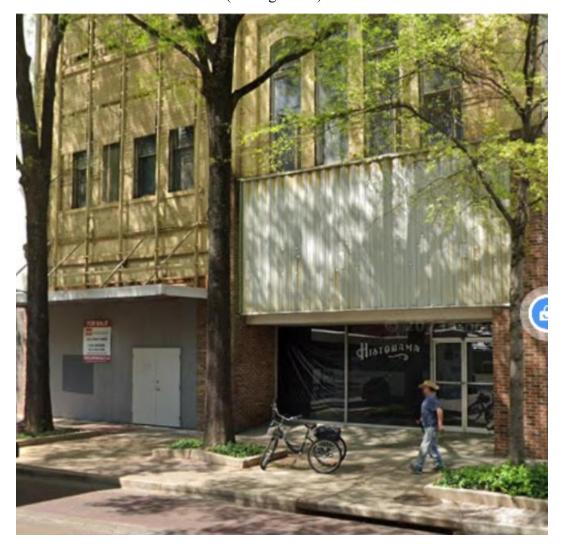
Jazzy Building Showing the Exterior of the First Level and Mezzanine on Market Street (Google Map Image)
